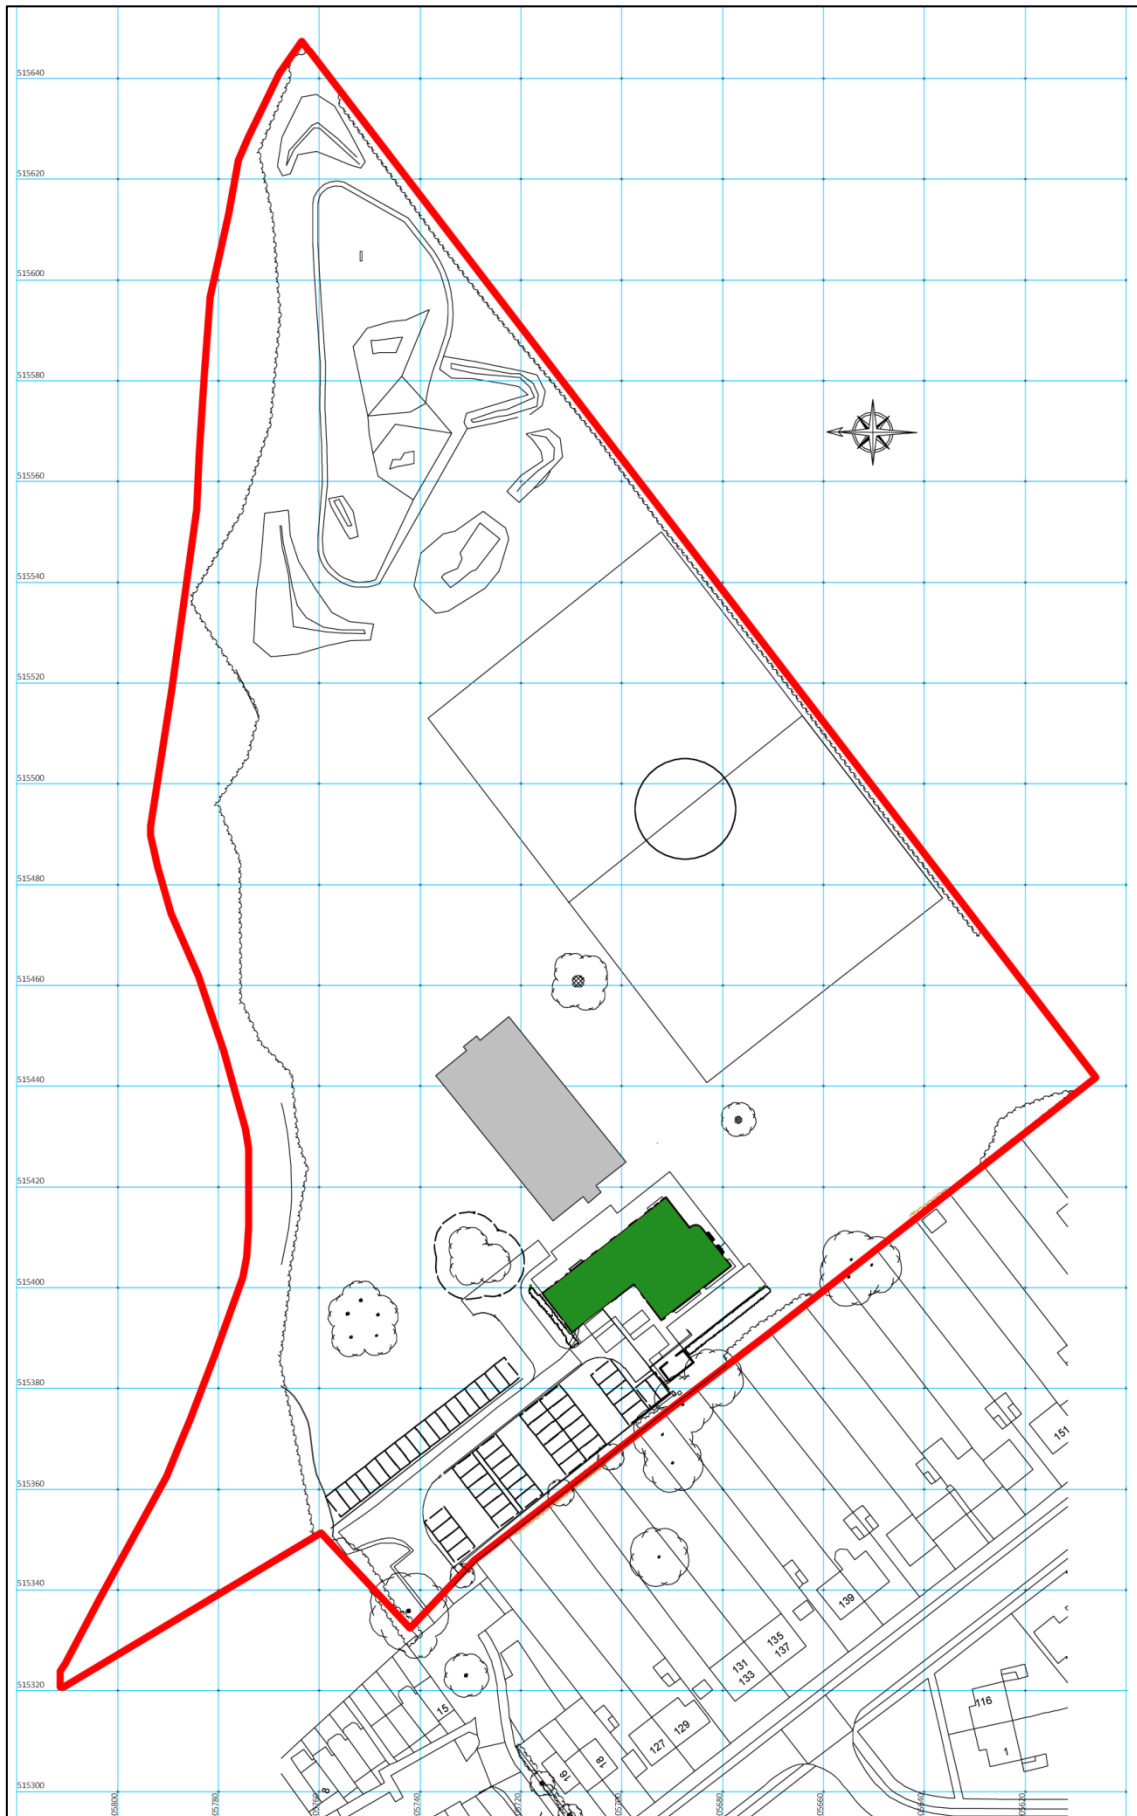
Proposed development (proposed development in green, scale 1:1500)
